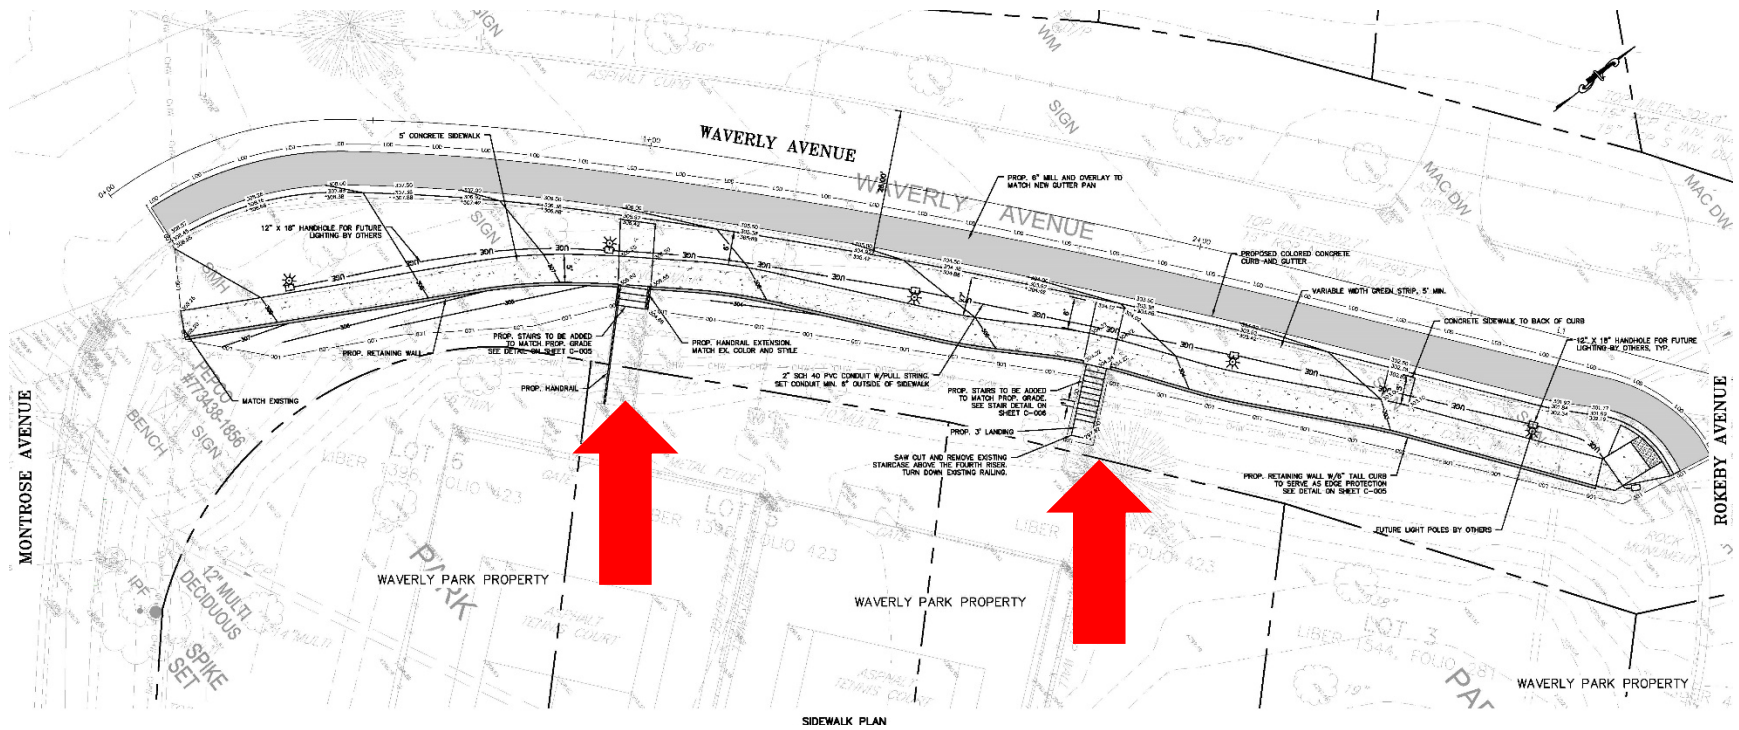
This site plan provided by the applicant shows the stairway locations to be altered indicated with red arrows.
